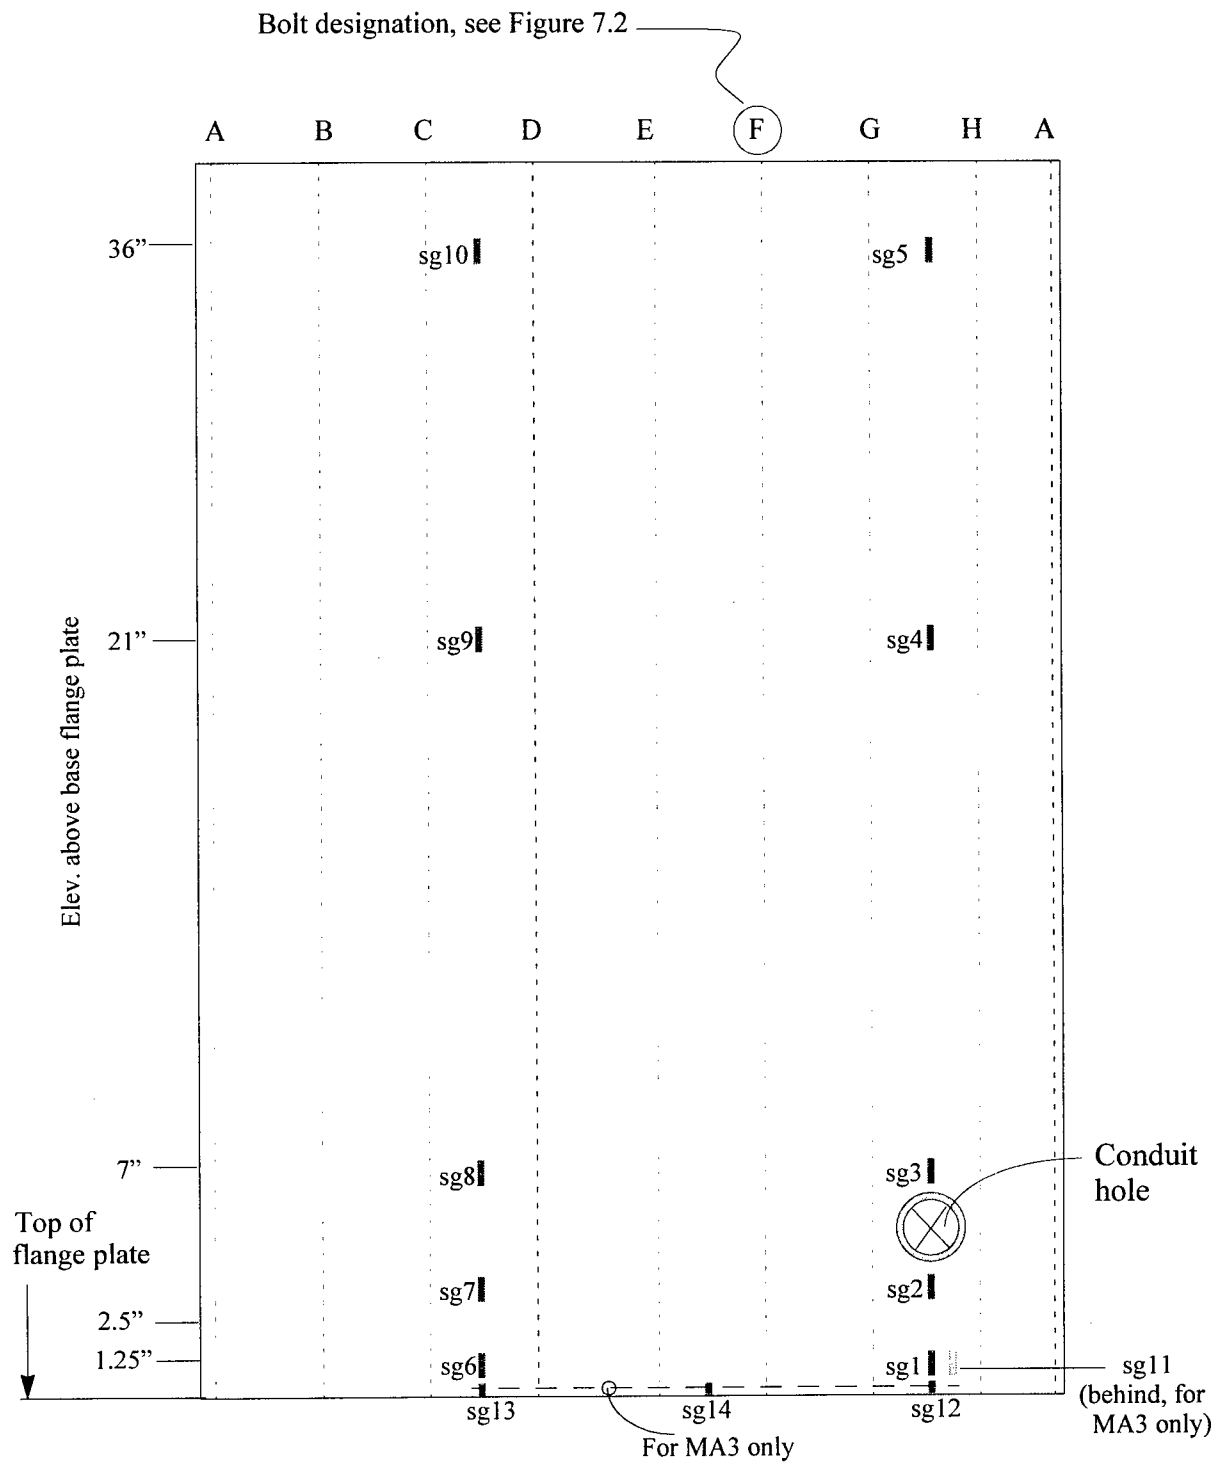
Exploded view of instrumentation for mast arm Specimens MA1, MA2, and MA3
